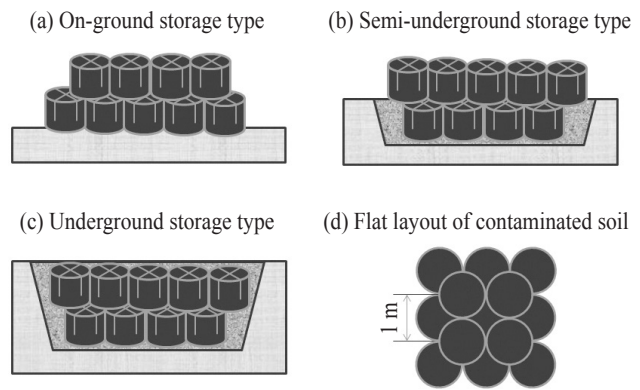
Different types of temporary storage facility: (a) On-ground storage type, (b) Semi-ground storage type, (c) Underground storage type and (d) Flat layout of contaminated soil.
